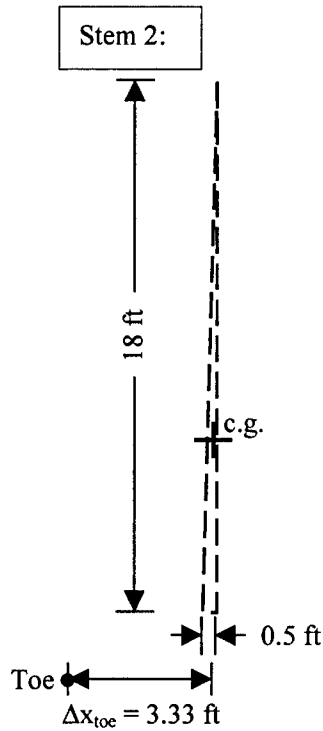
Division of wall and backfill into subsections for determining internal forces and centroids of structural wedge
